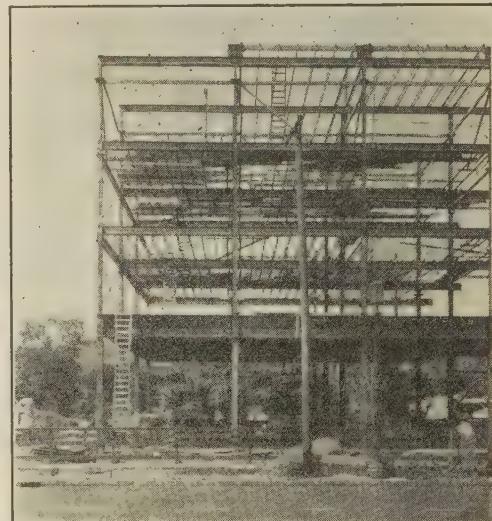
CLEVELAND OFFICE BUILDING. ILLUSTRATES DECREASE IN WEIGHT OF COLUMNS FROM THE FIRST FLOOR TO THE FOURTH FLOOR
